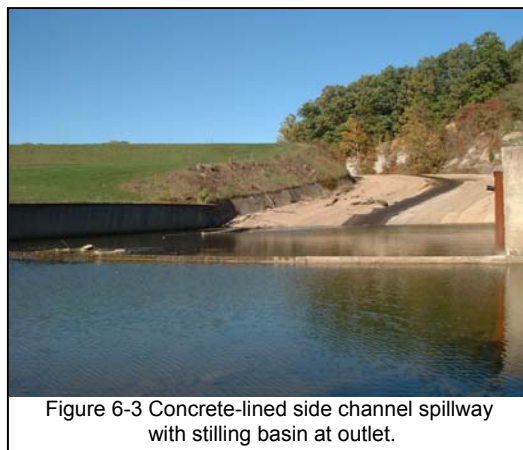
Concrete-lined side channel spillway with stilling basin at outlet.
